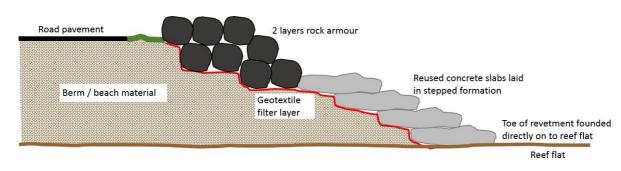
Cross-section of the proposed reconstructed revetment at Paal. Source: Project Proposal Document
